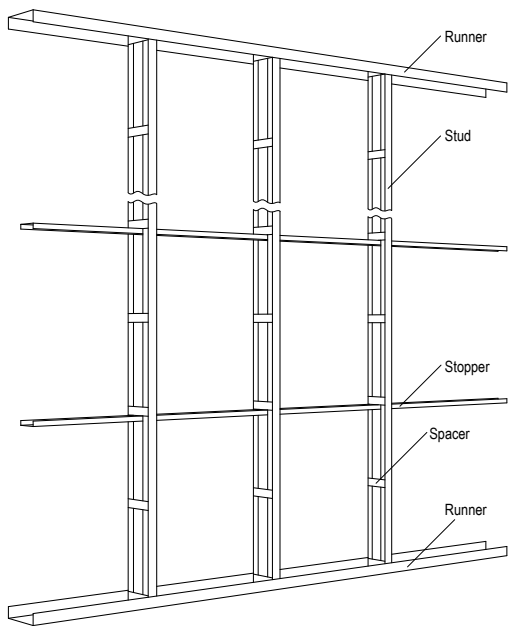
Light gauge steel furring for wall (source: JISA 6517)
